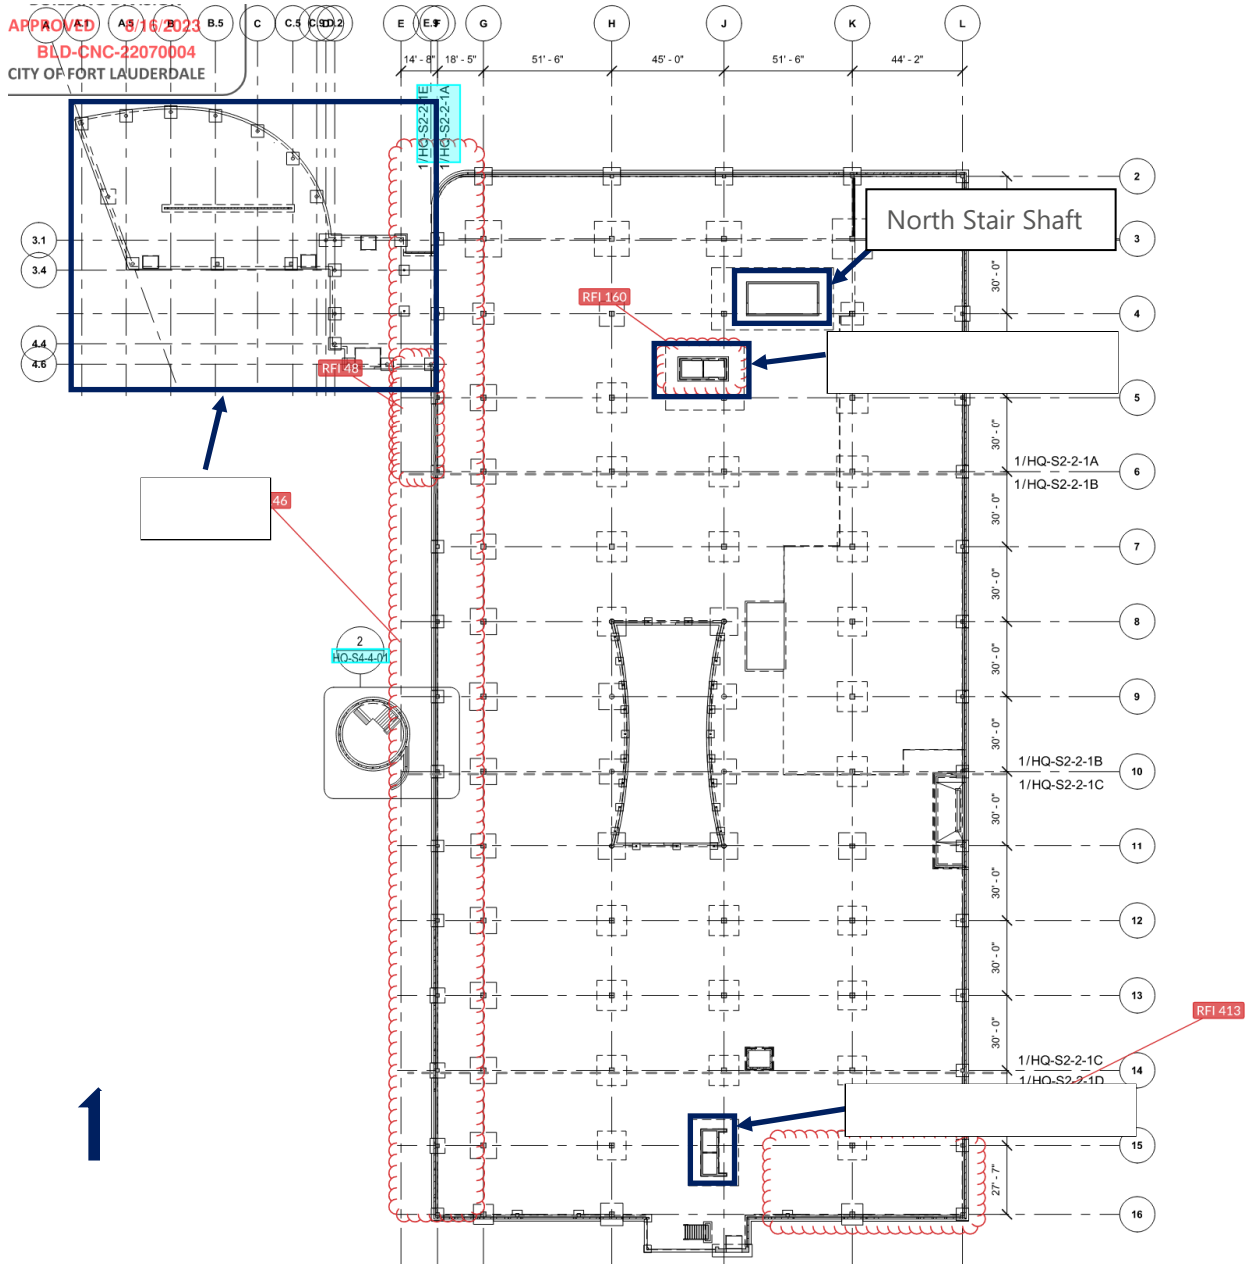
Plan view of the foundation level of the FLPHQ from Sheet HQ-S2-2-01 (dated June 10, 2022) of the structural design drawings with gridlines and shear wall locations shown. Annotations in blue by WJE
